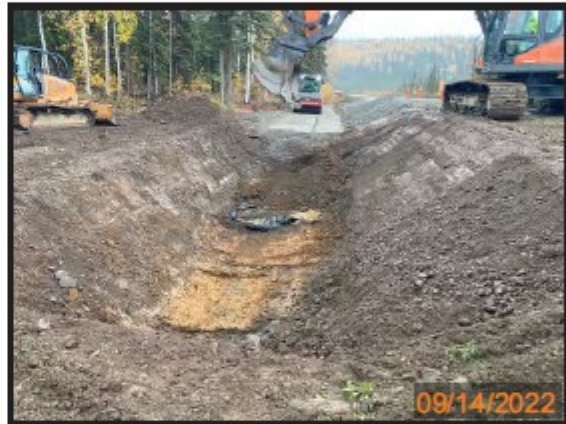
Viewed East- Pink Xs marking contaminated soils remaining in the prism with contaminated stockpile in excavation.
